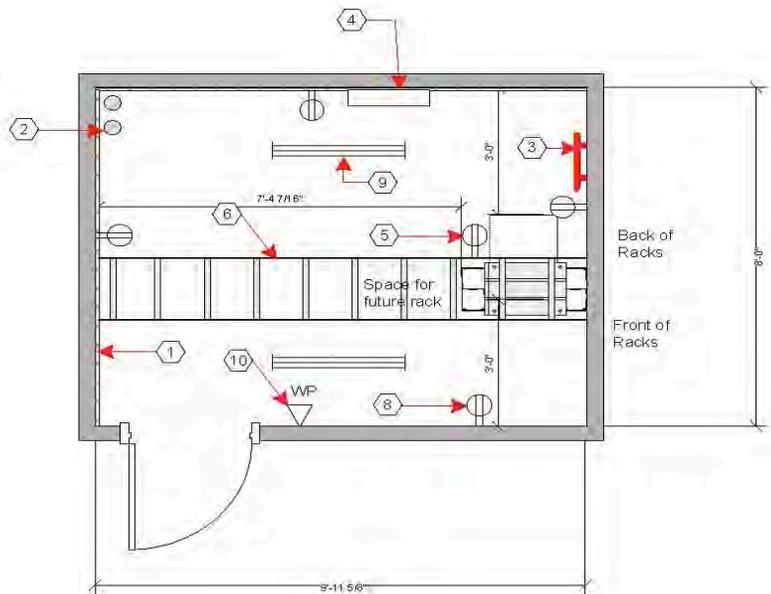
Typical OMS/AMSA/Heated Storage Telecommunications Room (TR) Plan View
